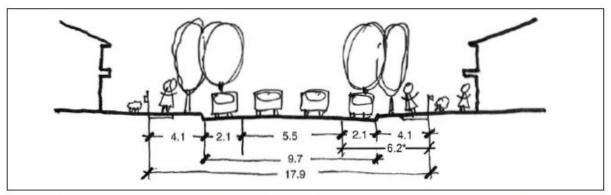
Access street B – wider access street Target speed 40 km/hr (< 3000 vehicles per day). (Note – Figure 20: On an Access Street B that is a potential future bus route, on-street parking would only be permited on one side to meet City of Swan requirement of bus route 7.4m carriageway.)
